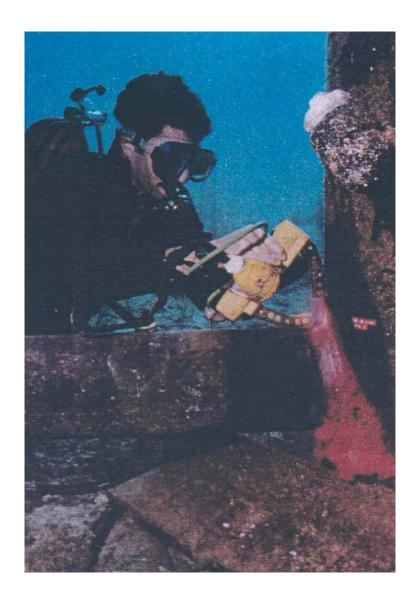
Underwater Magnetic Particle Inspection.
